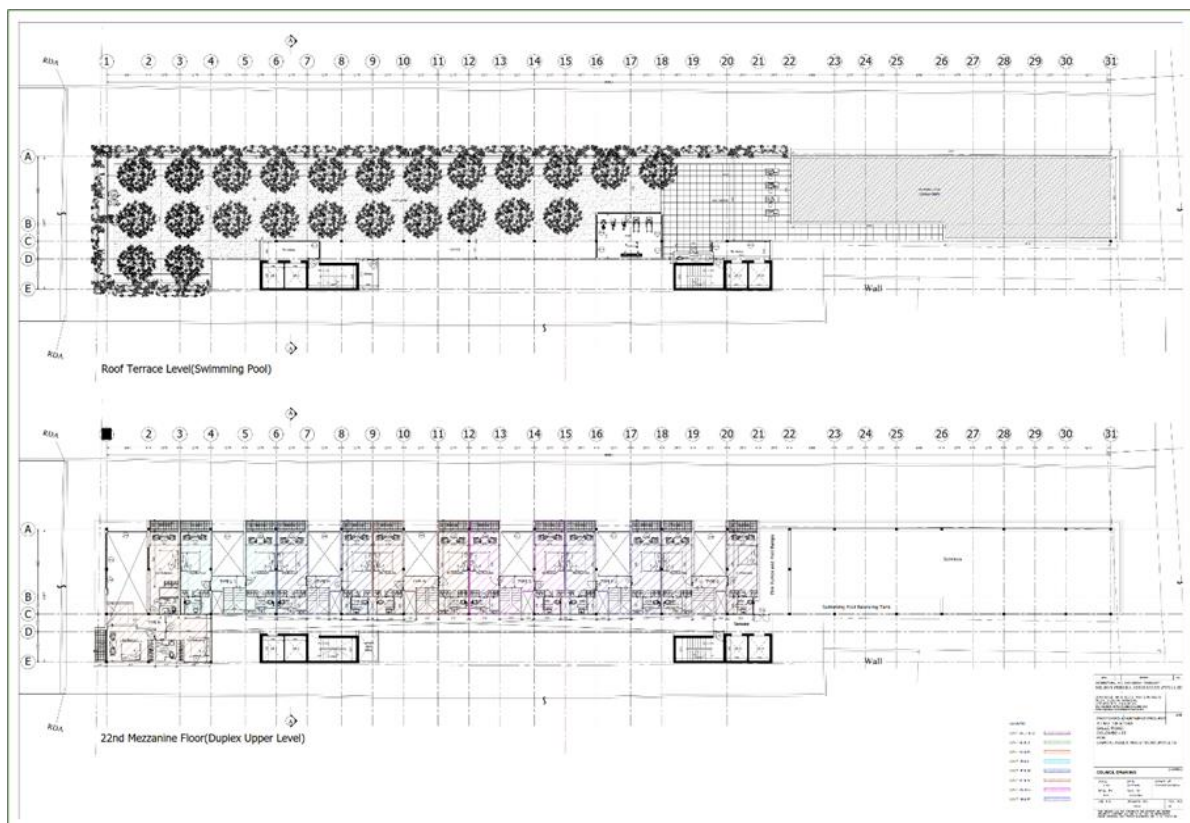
typical Floor layout of floors 1 to 21st floor shows in and 22
